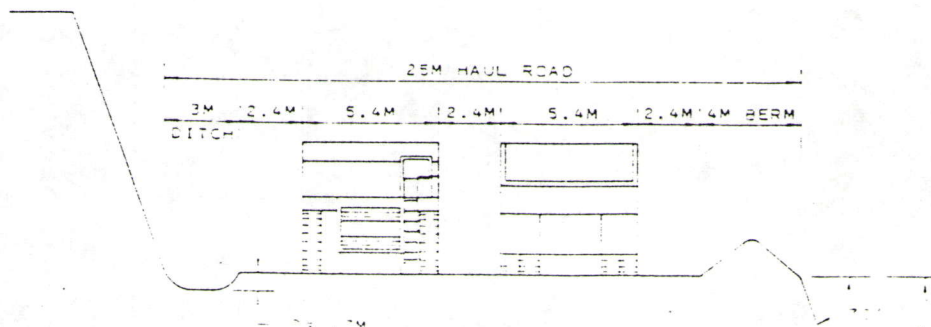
Typical design haul-road width for two-way traffic using 77.11-t (35-st) trucks.
